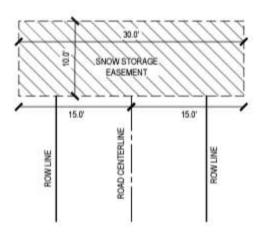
# Exhibit A – The Orchards at JDC Ranch Phase 3 Proposed Final Plat
